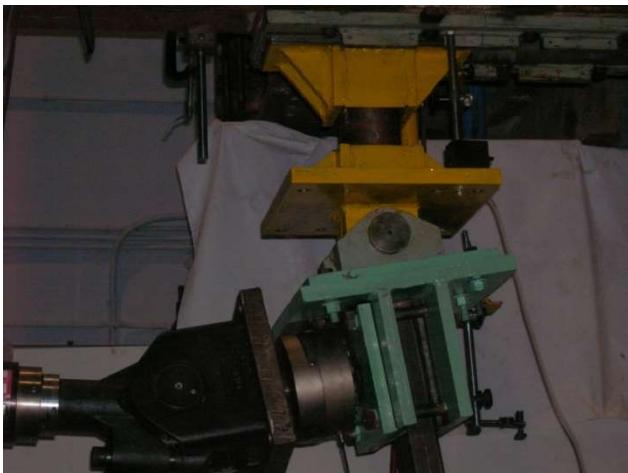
Hinged-Rigid-Sliding arrangement of Hydraulic Jack
